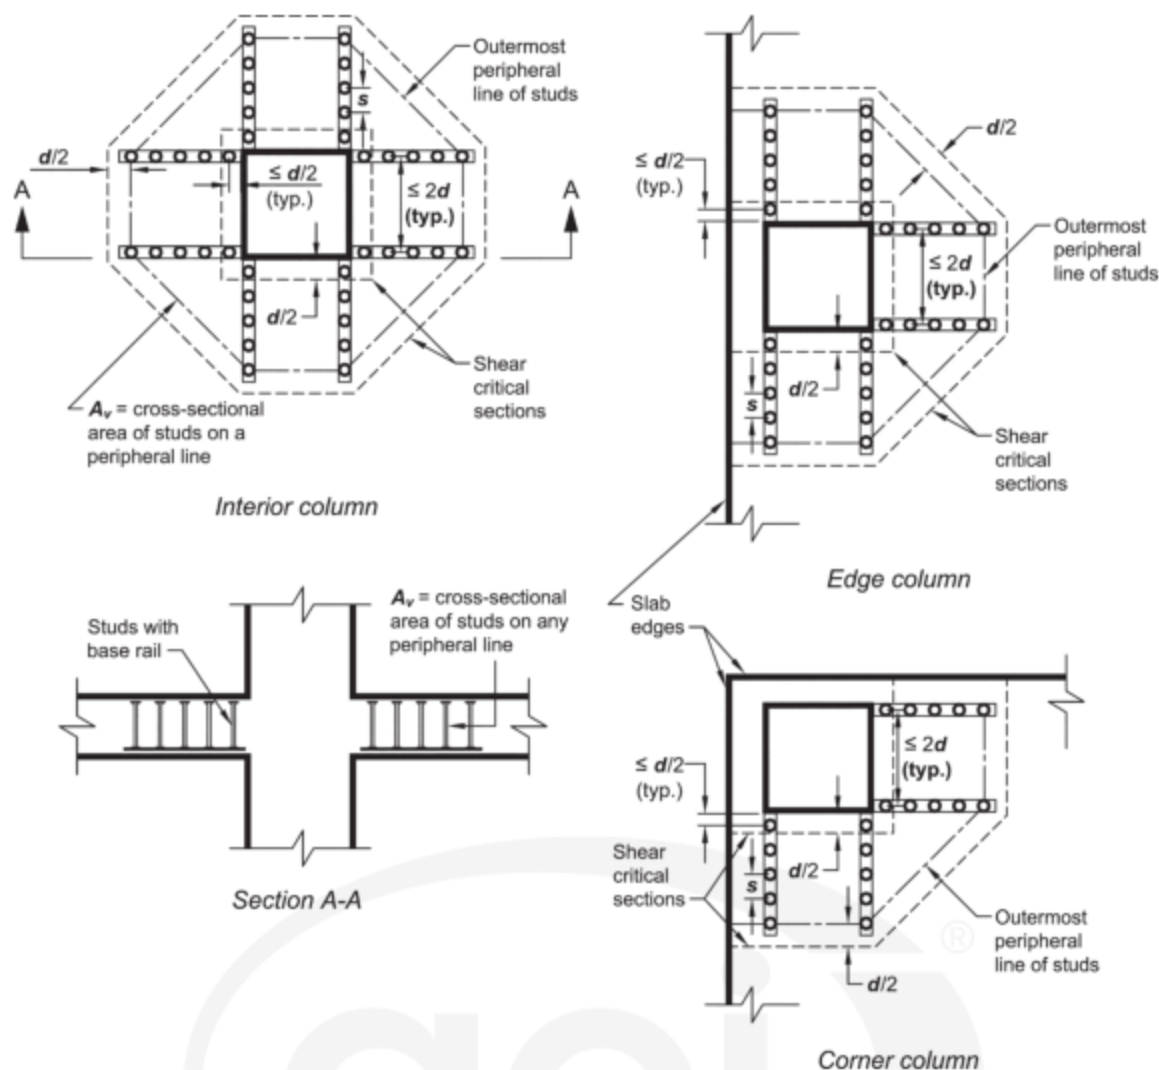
Typical arrangements of headed shear stud reinforcement and critical sections (Code Fig. R8.7.7).
